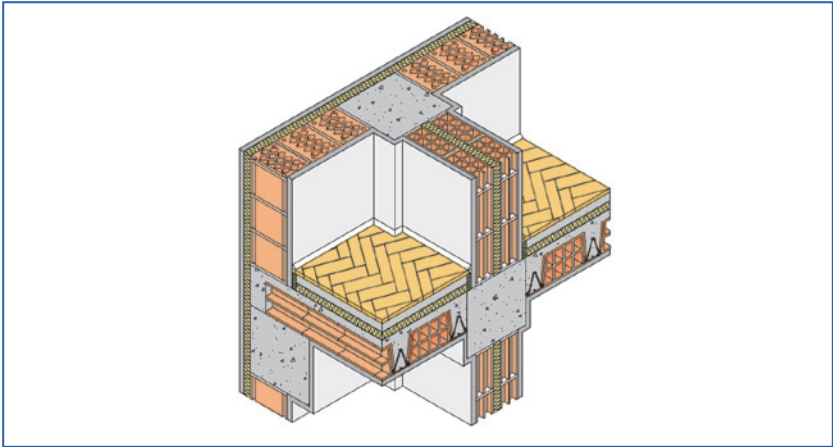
Example of current separating wall and floor construction in Macedonia.
